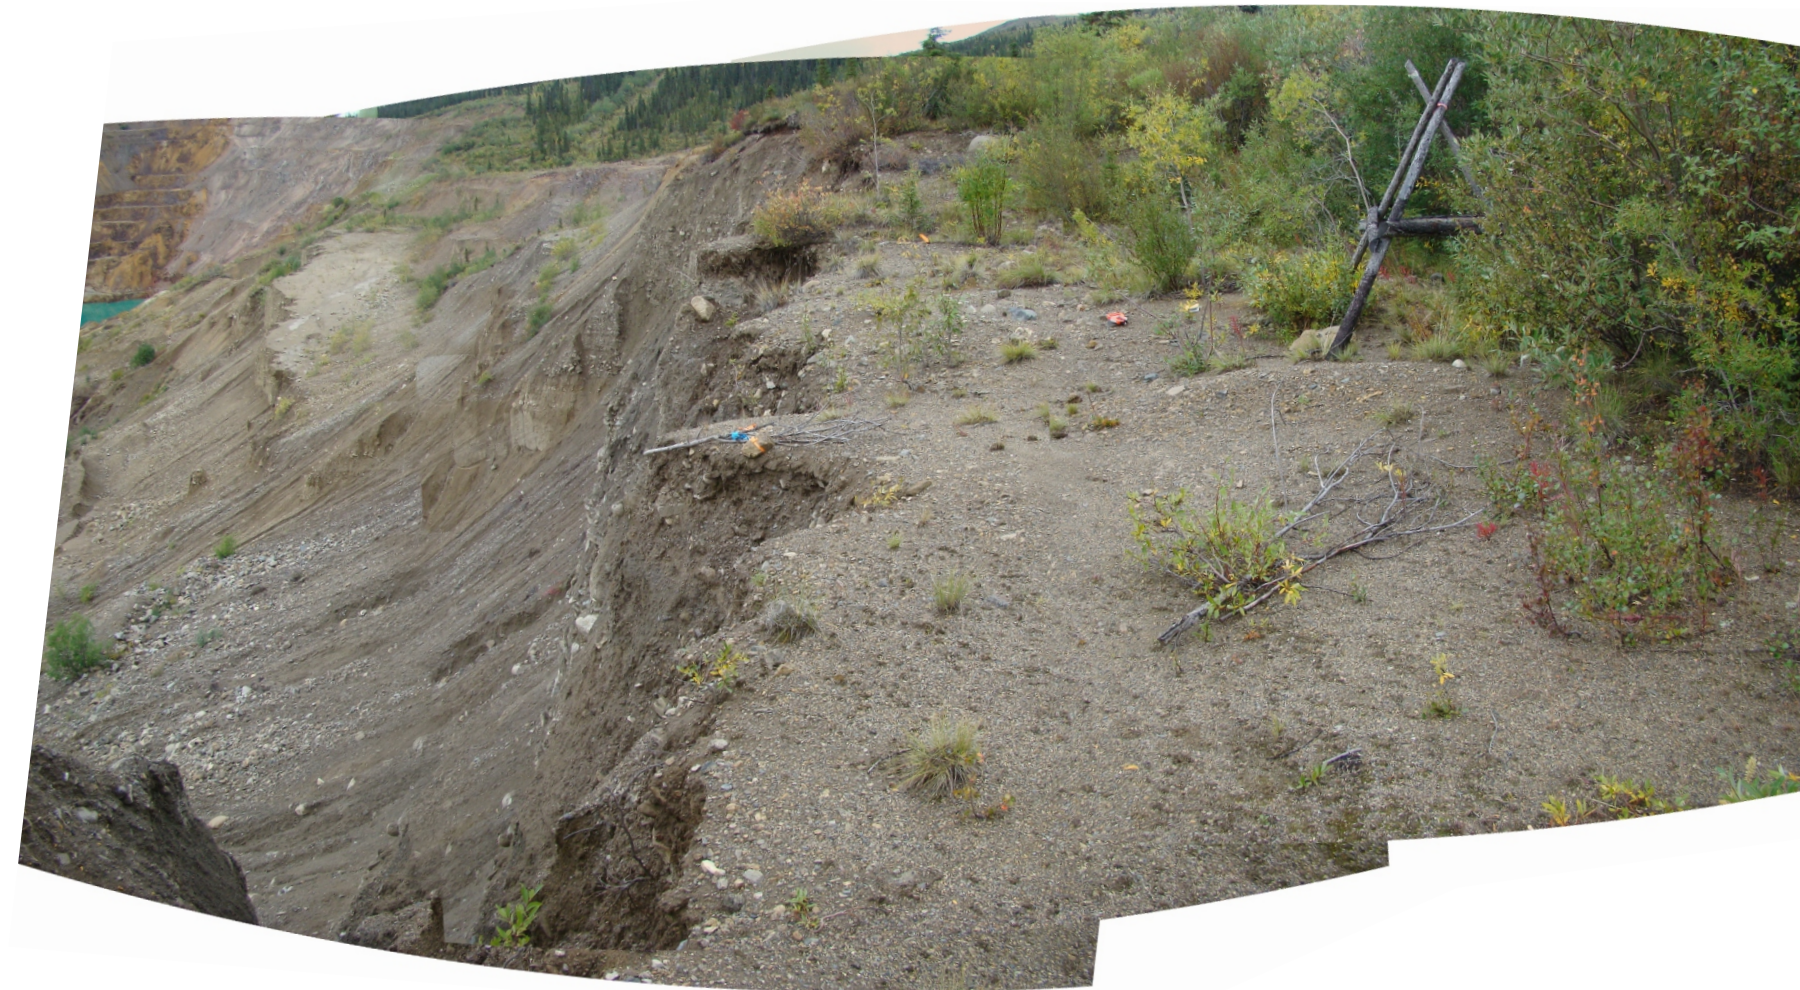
North instability zone. View of the crest of the pit wall (August 2009).
